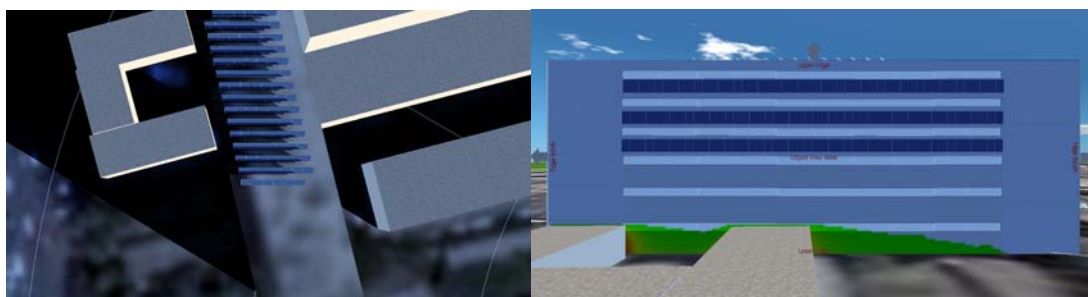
(a) roof mounted PV system; (b) west elevation PV.
